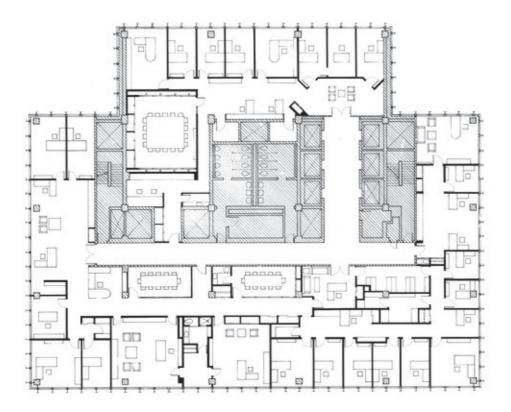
Seagram Building, New York, 1954-58. Architect: Ludwig Mies van der Rohe. Grey hatch pattern: the building shell.
